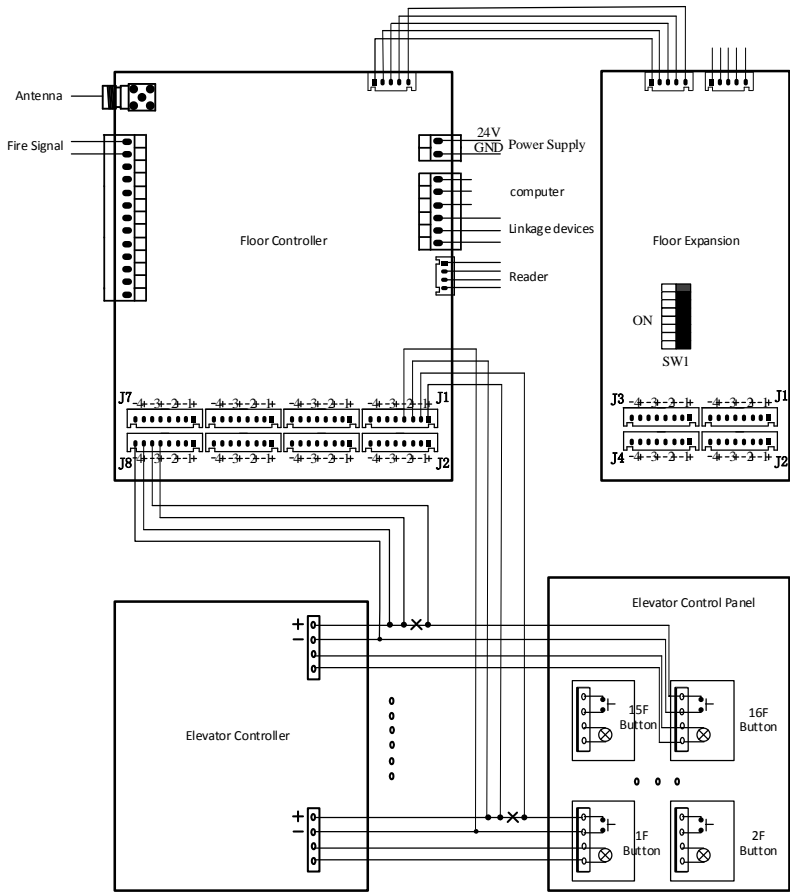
Elevator Floor Controller Wiring Diagram
